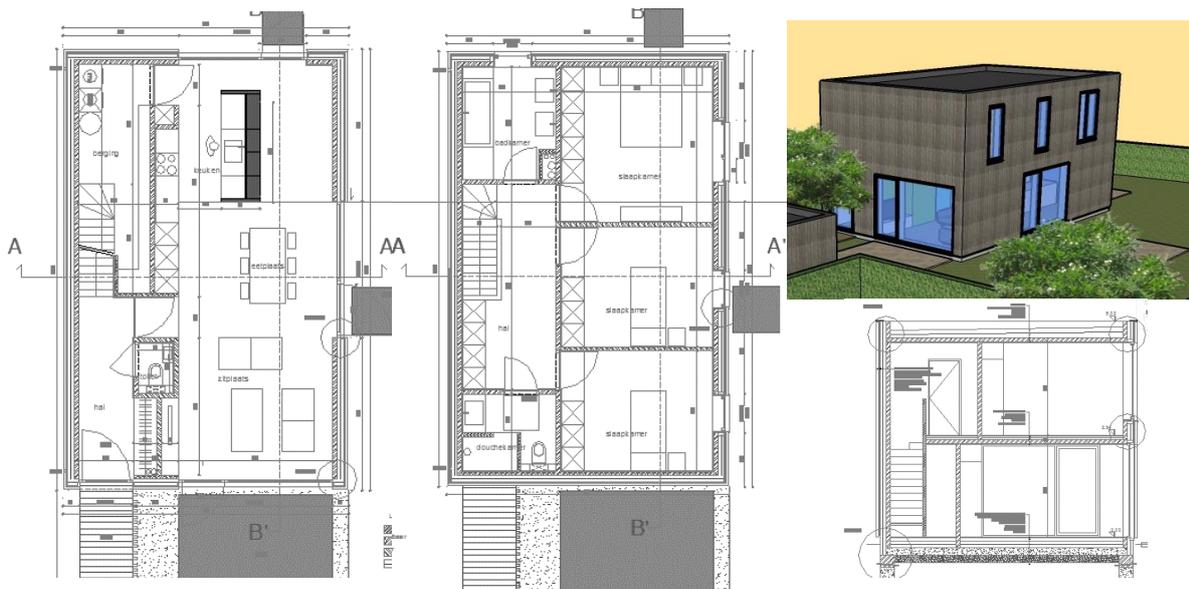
Case study project in Moorslede, Belgium: Floor plans, section, visualisation.
